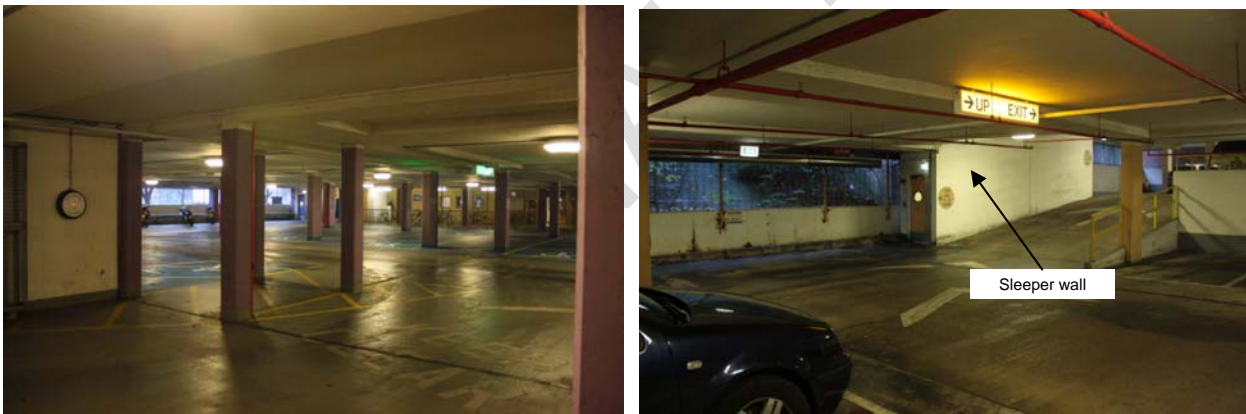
photos showing vertical beams and sleeper walls around the car park levels
